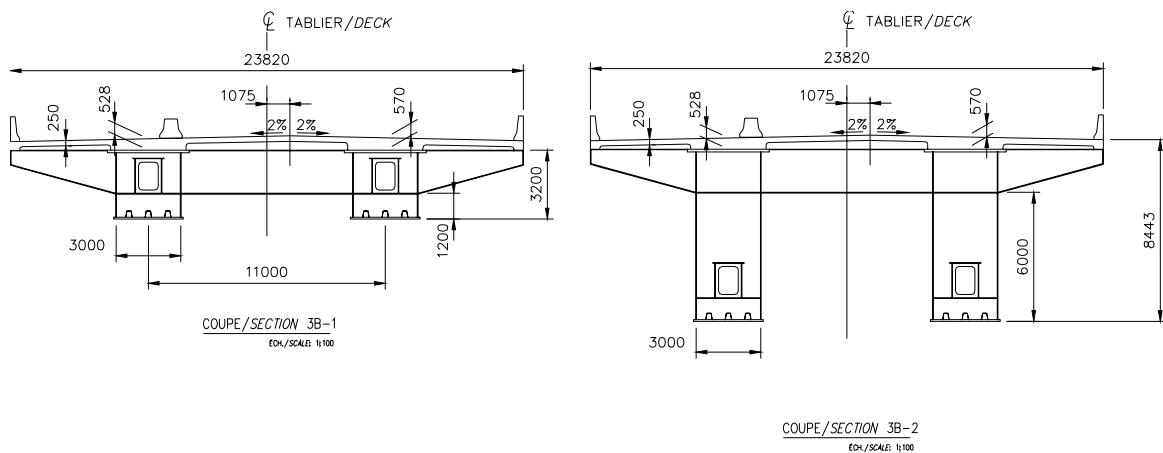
Cross-sections – Mixed frame bridge – twin-beam
